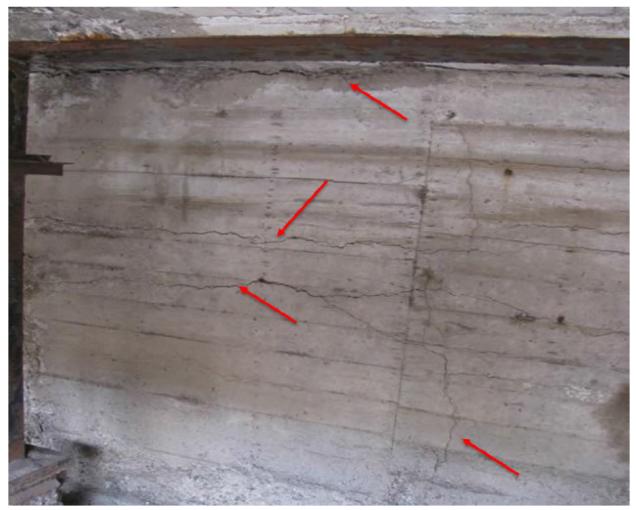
Horizontal cracking in the partition wall separating the Unit 4 Cell Floor Area from an air passageway
